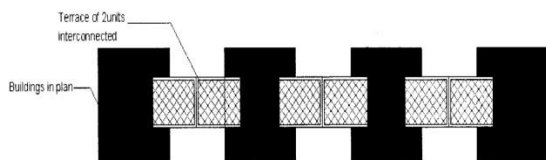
shows plan of buildings that are linked by terraces in a large scale complex.
